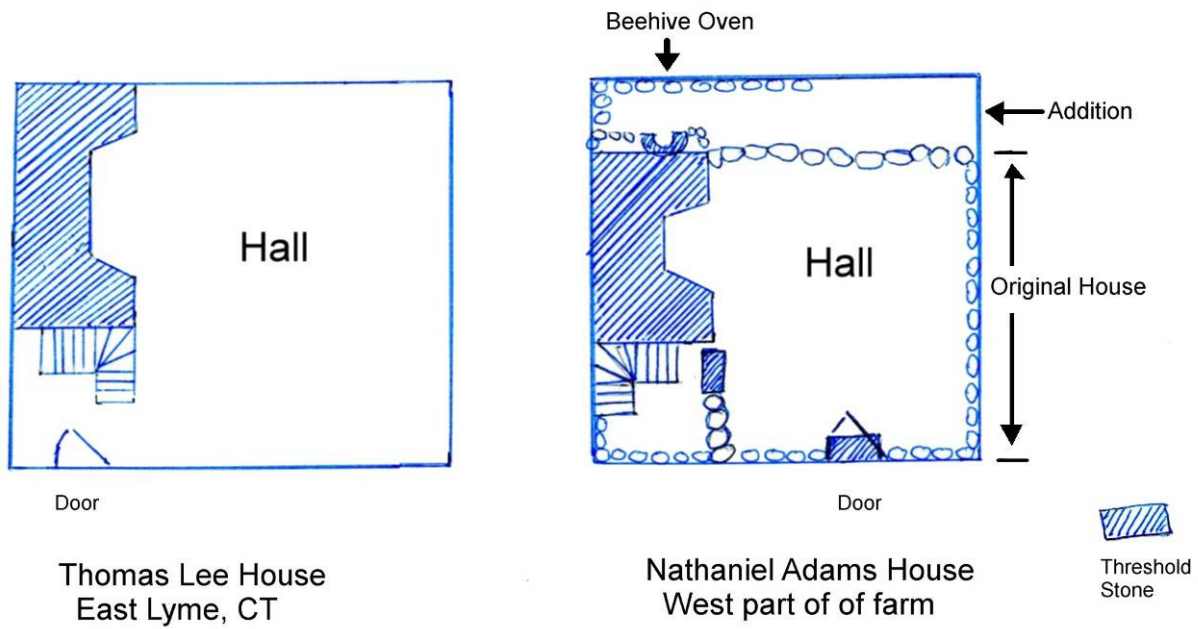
Floor plan of Lee house in Lyme, CT (first stage) compared to the Adams foundation.
